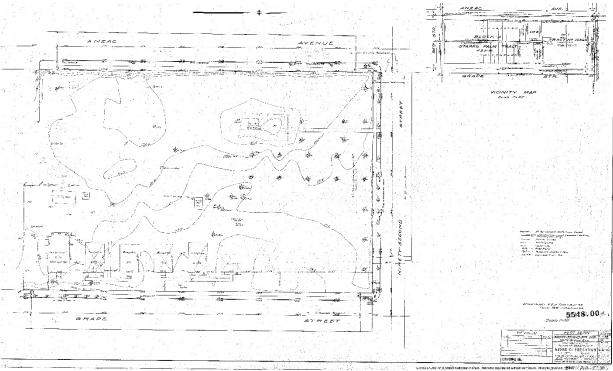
Plot Plan of 92nd Street Elementary School (1930) SOURCE: LAUSD Vault Drawing No. 5548.00.000 [001]
